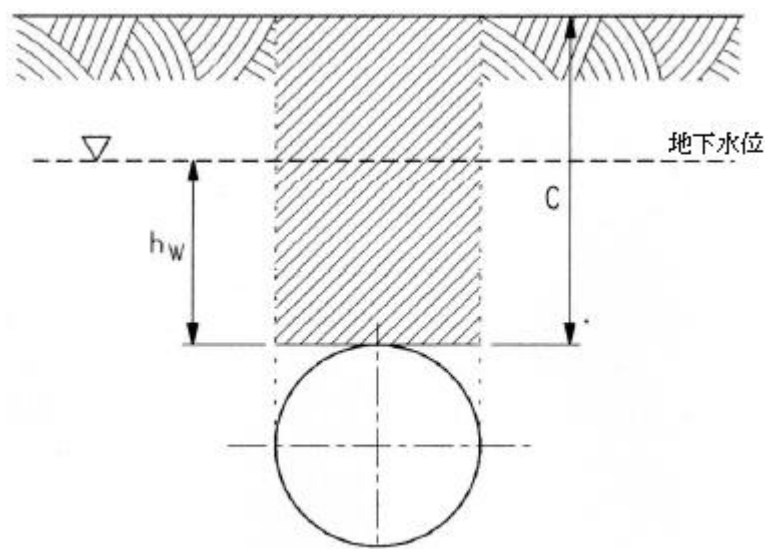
Soil Prism Above Pipe 管上の土の角柱
